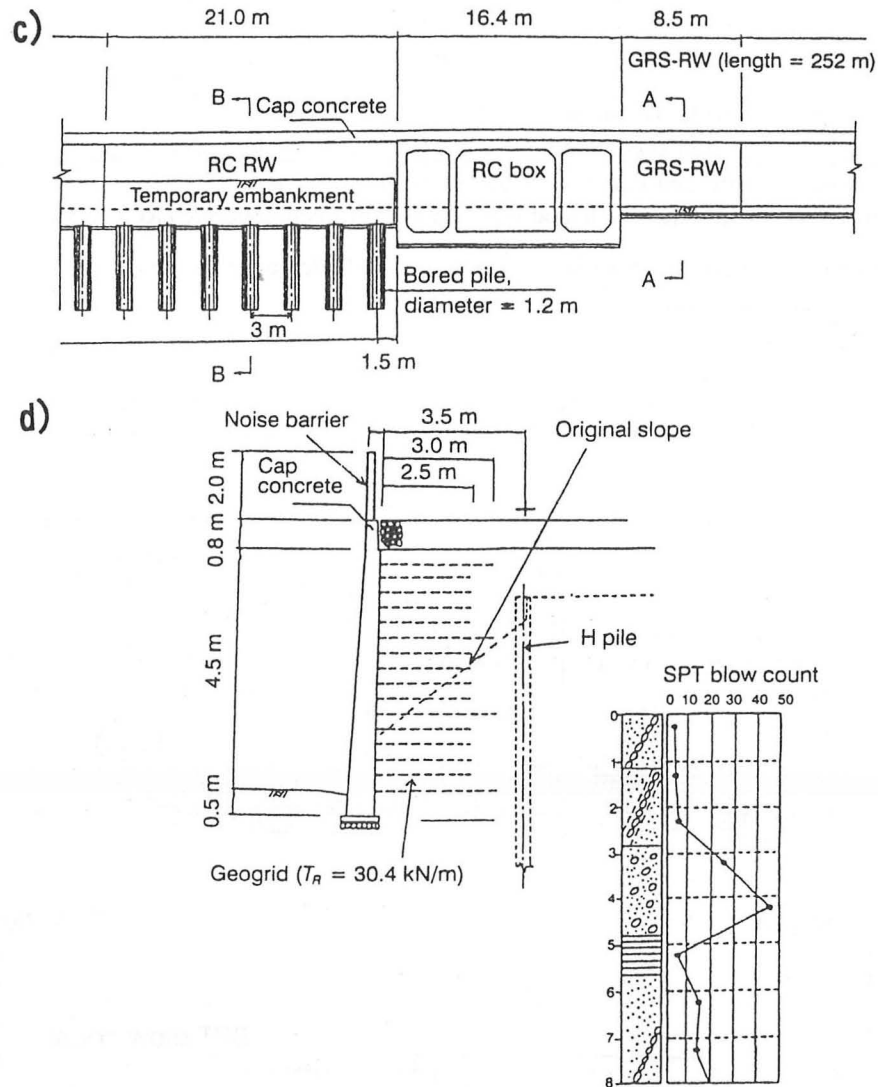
continued. c) front view (from south) of GRS-RW and RC retaining walls, supported with a pile foundation; d) typical cross-section of the GRS-RW (Location No. 5 in Fig. 2 and GR1 in Fig. 4).
